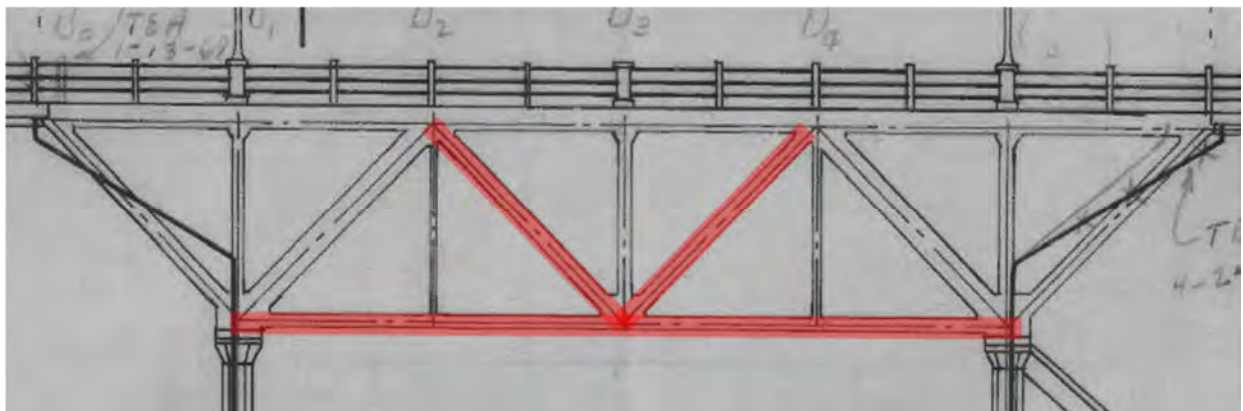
Critical Elements of Truss Under Vehicle Loading at North Bridge
